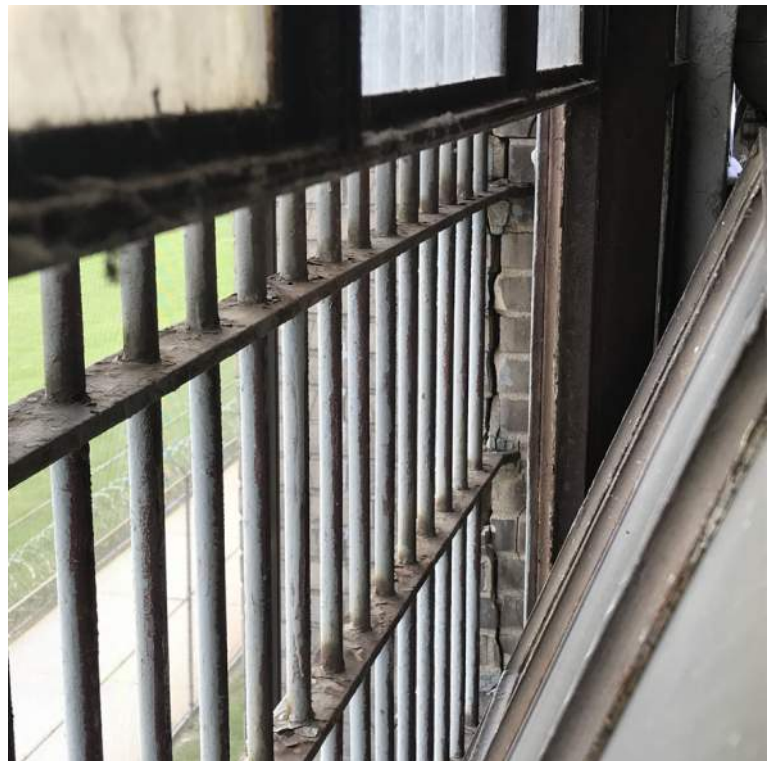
Masonry Wide vertical cracks at Barred Grille
